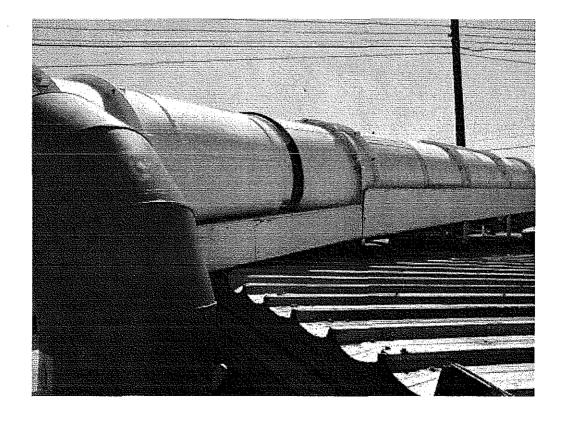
(Photo 5): Scrubber #3 ductwork seen from west side, at south roof.
